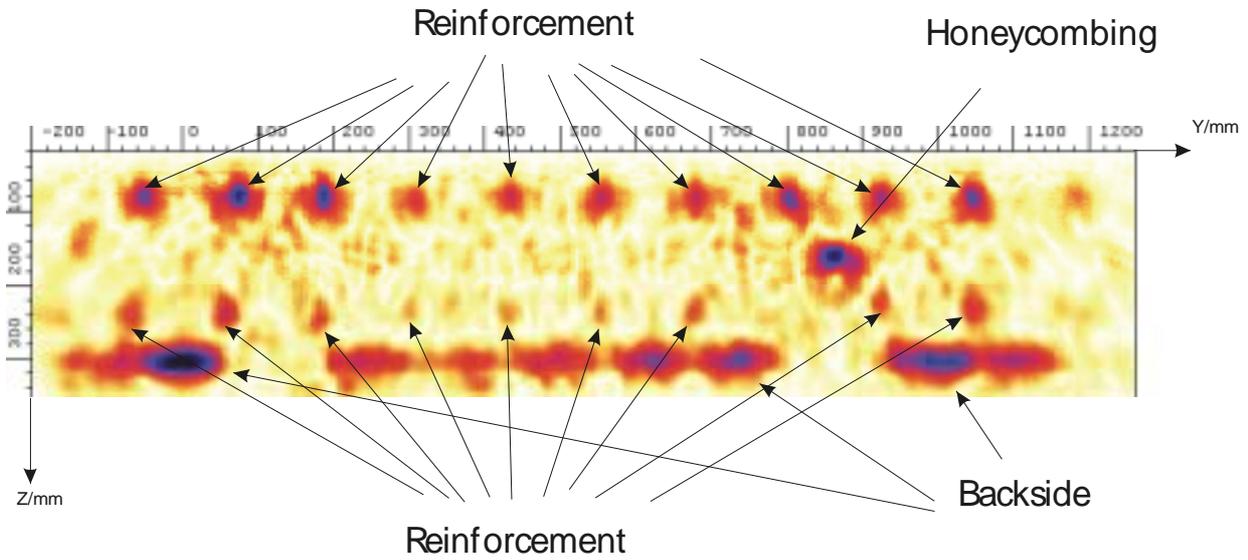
3D-SAFT: B-Scan of base plate with reinforcement and two artificial flaws 88 mm x 34 mm
